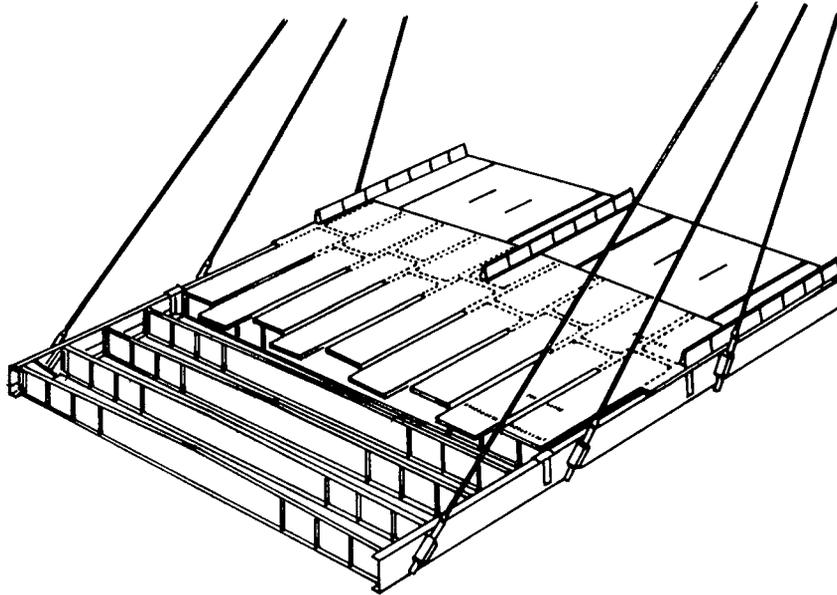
Composite steel-concrete superstructure girder of a cable-stayed bridge.
